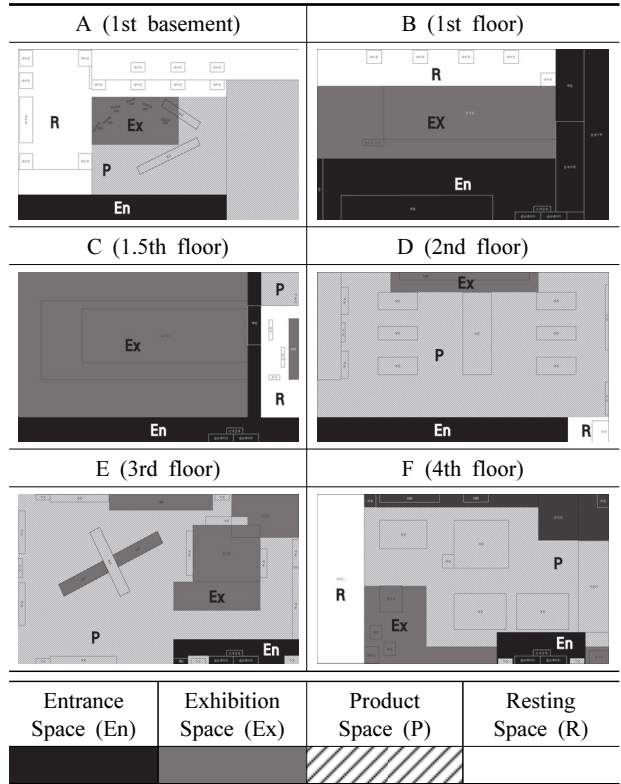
Floor-by-floor bird's-eye view and theme space composition
